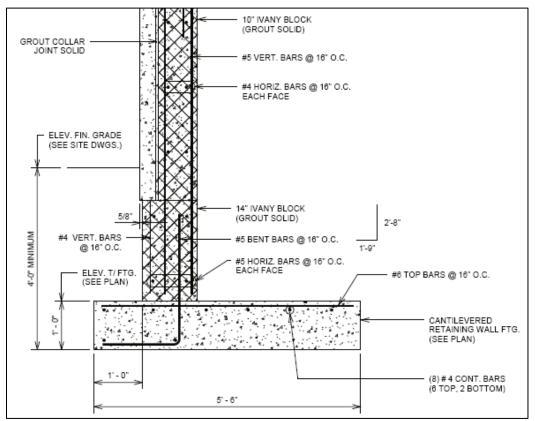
CMU to Footer Connection Details from Sheets S3.0 - Architectural Plans – WTW Architects
